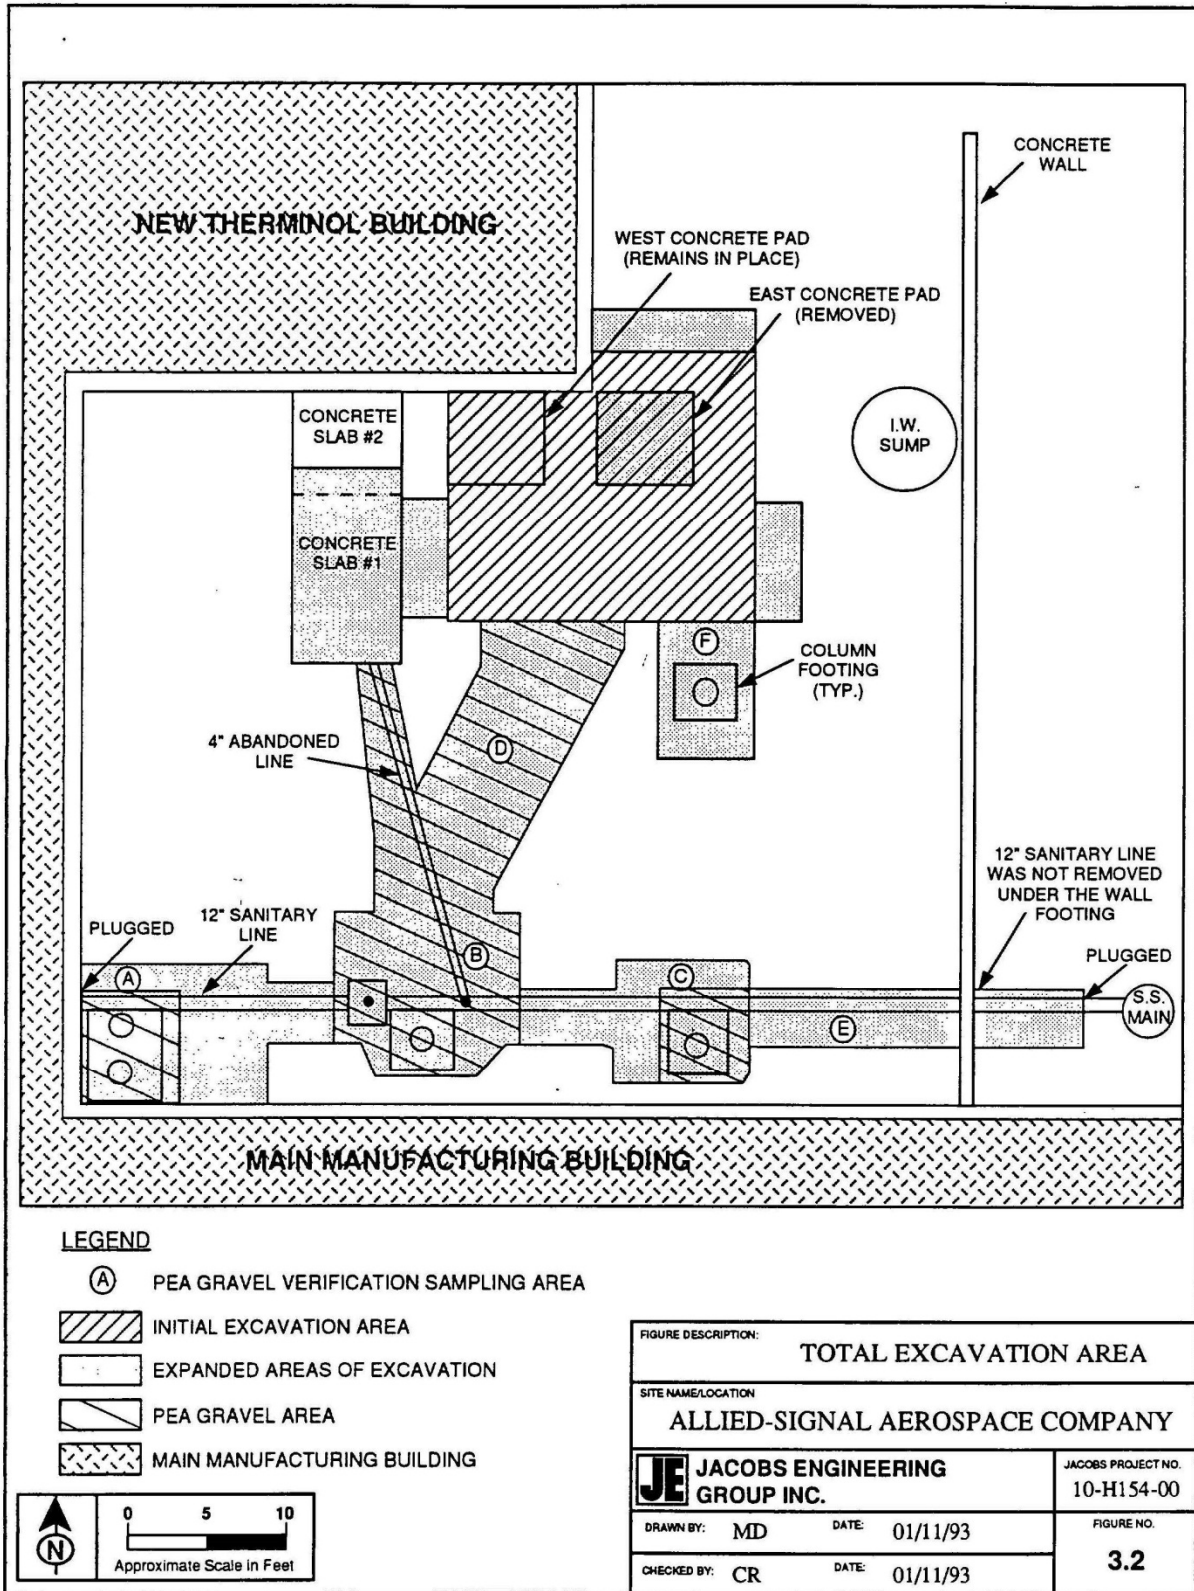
Expanded Excavation Plan After First Round of Verification Sampling
